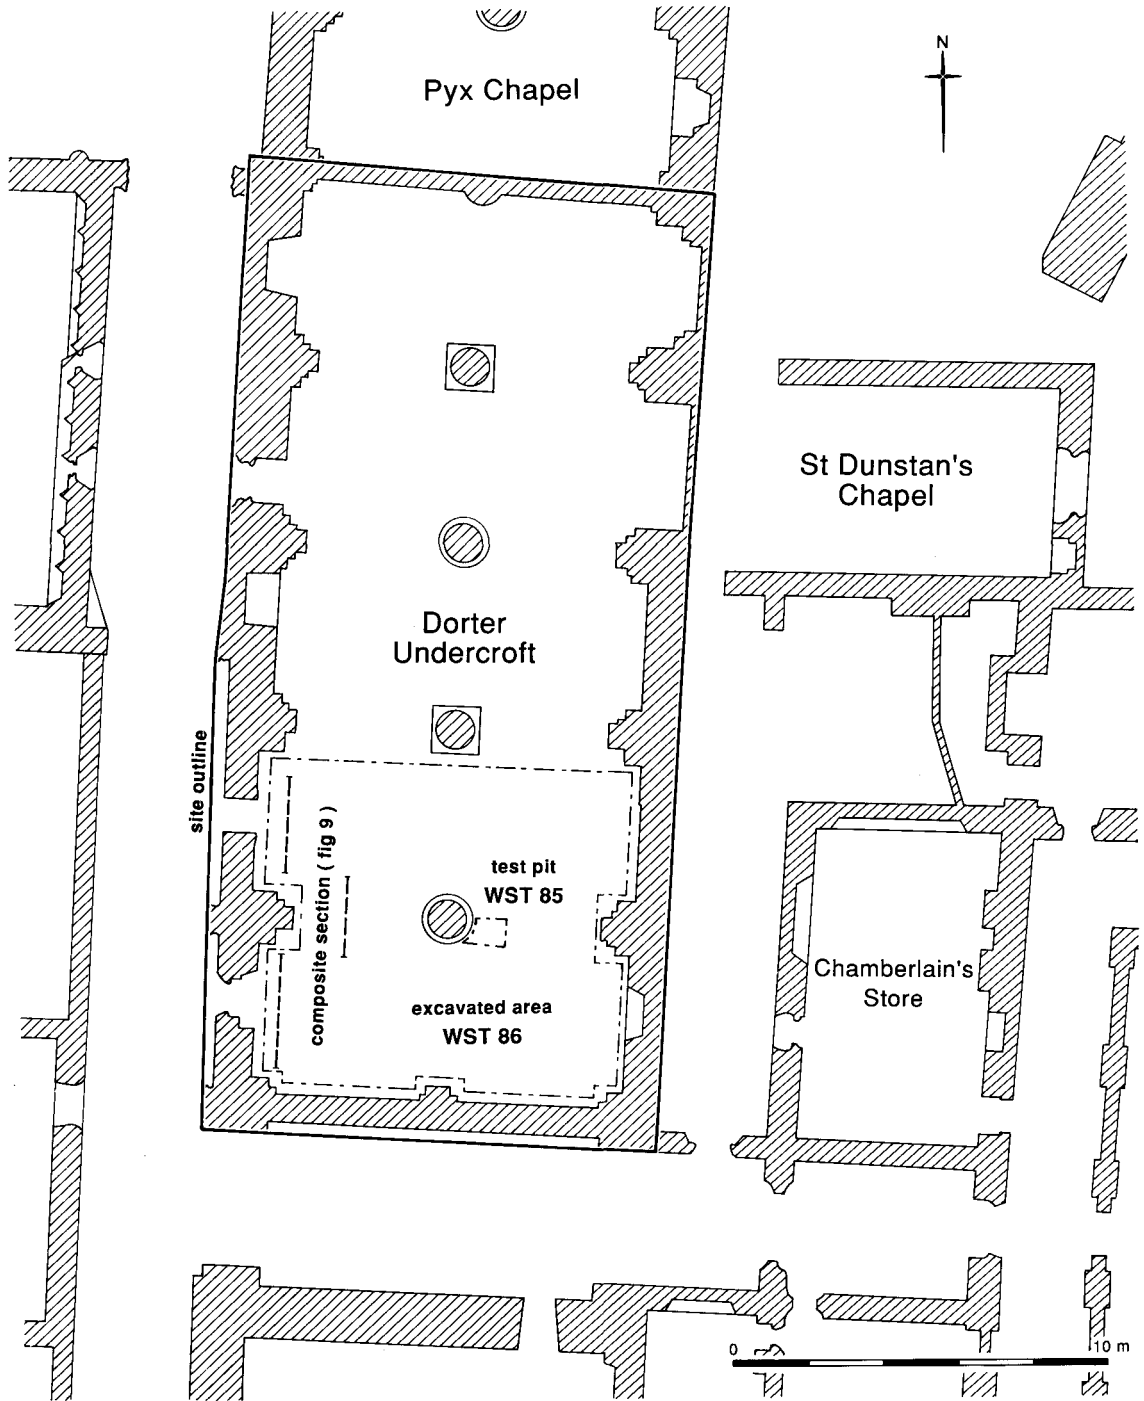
Plan of the site showing position of the excavated area, illustrated section and location of trench WST85.
